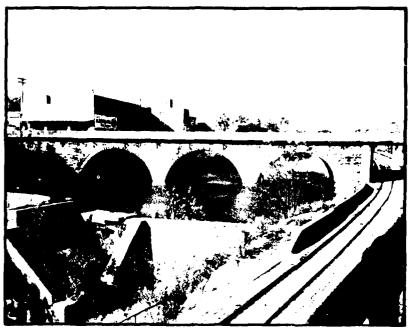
Downstream face of West Main Street bridge, stream mile 55.00.
